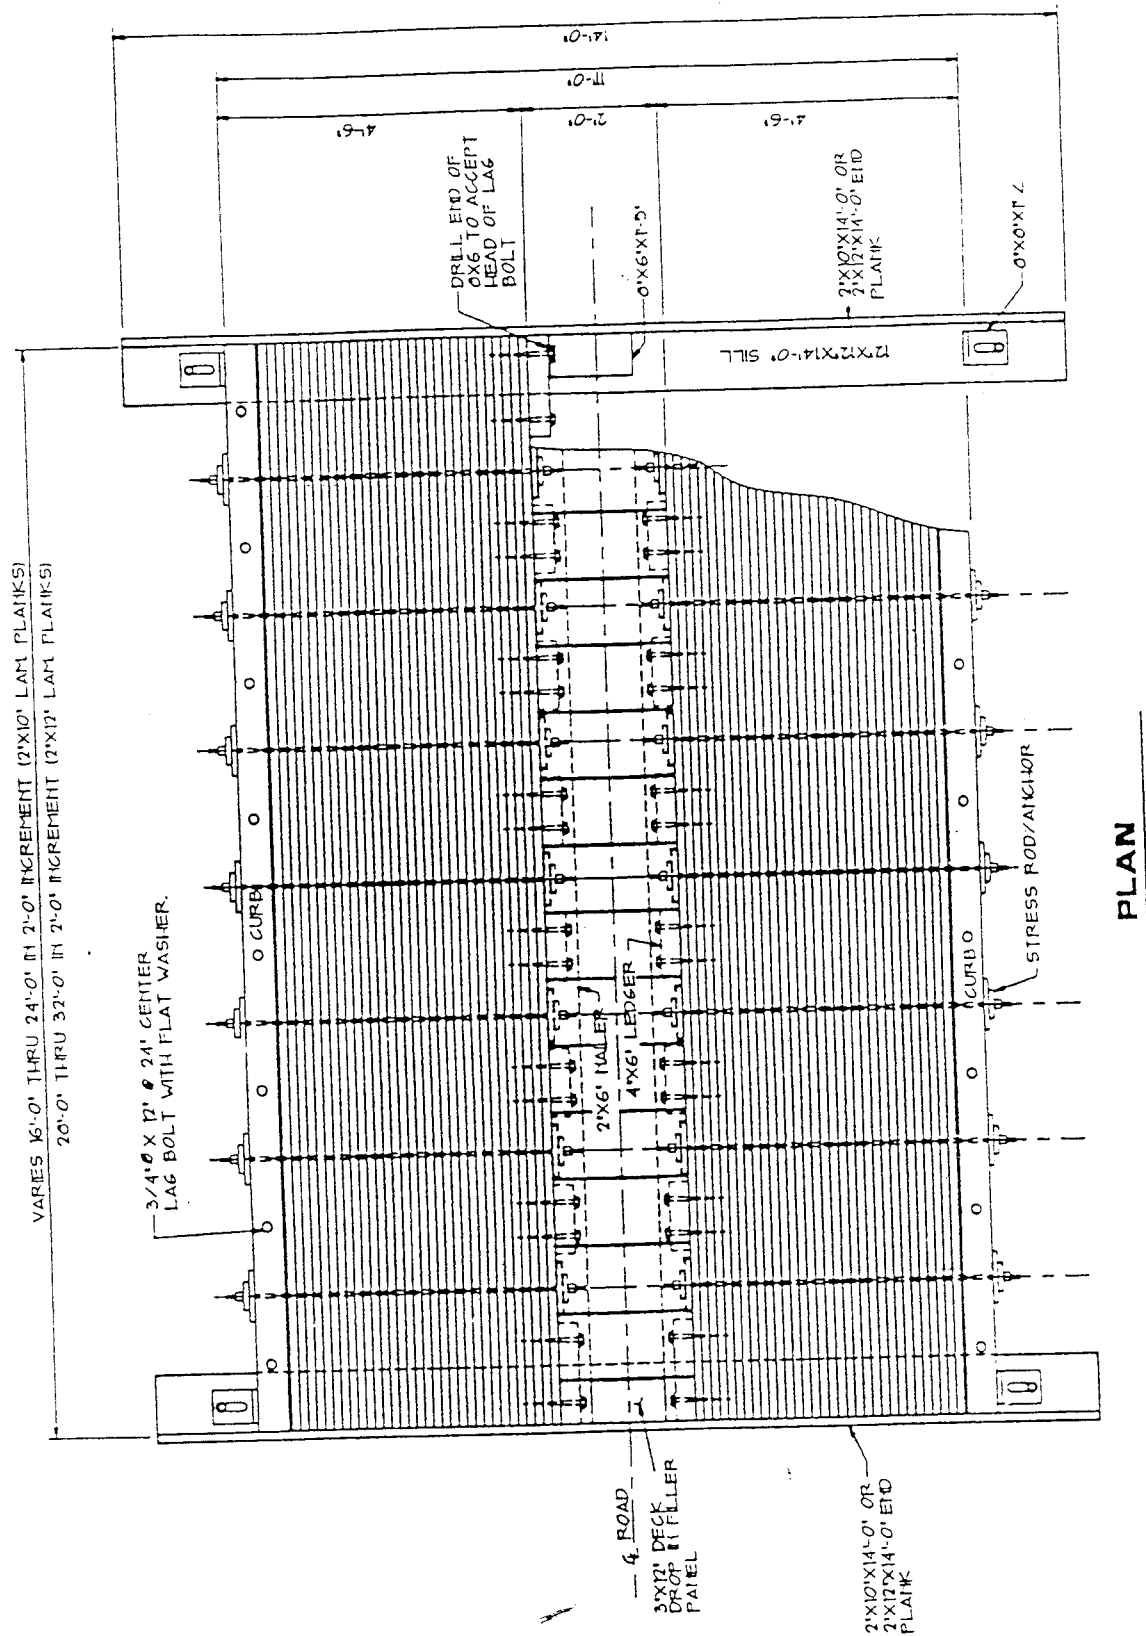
Plan view of the longitudinal stress-laminated timber deck bridge.
